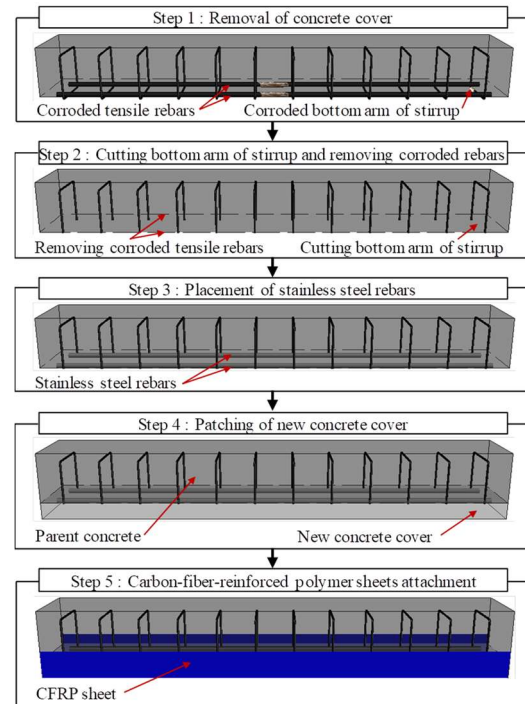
Procedure of retrofitting method for corroded RC beams using SS rebars and CFRP sheets.
